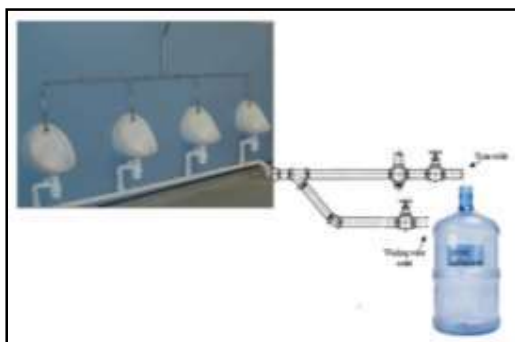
Modified urinal washroom showing urinal outlet and washing water outlet.
